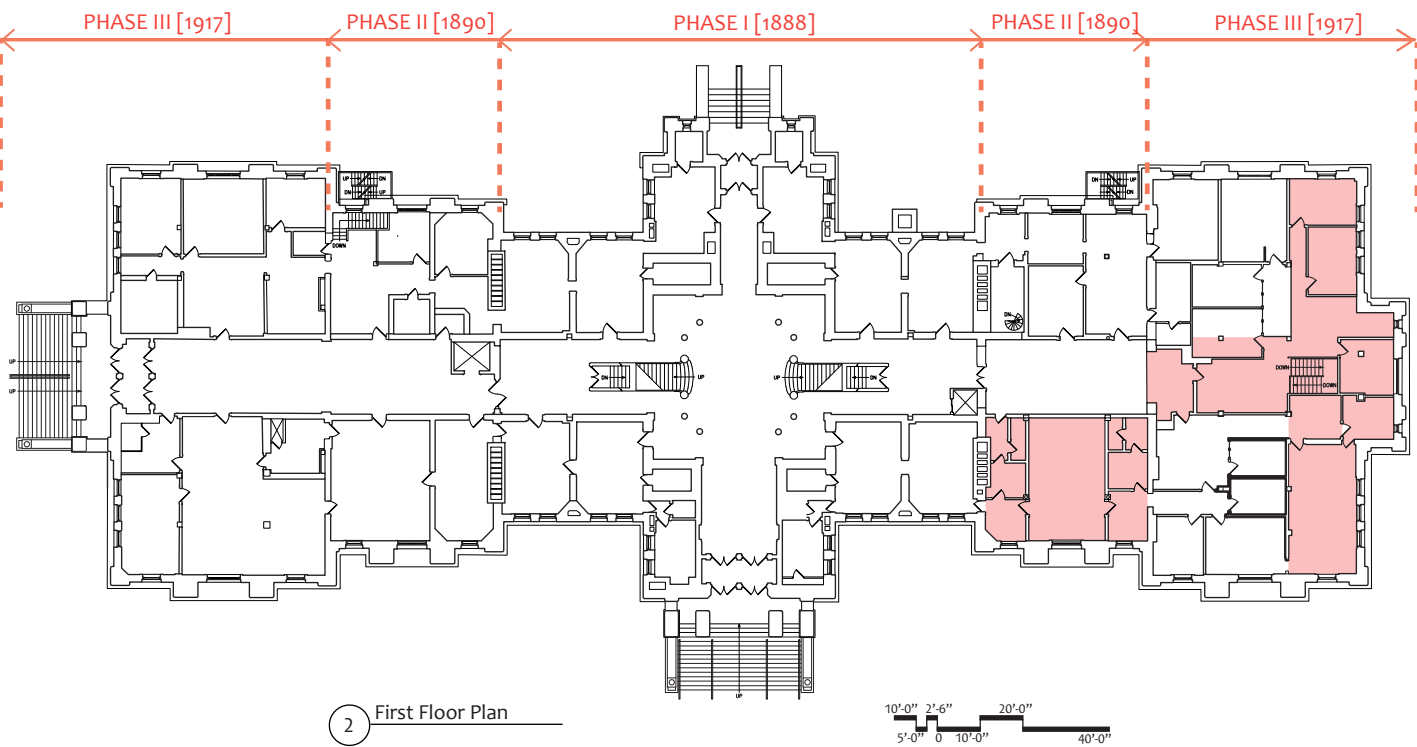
First Floor Plan [Governor's Suite and Ceremonial/Signing Room highlighted in orange]
